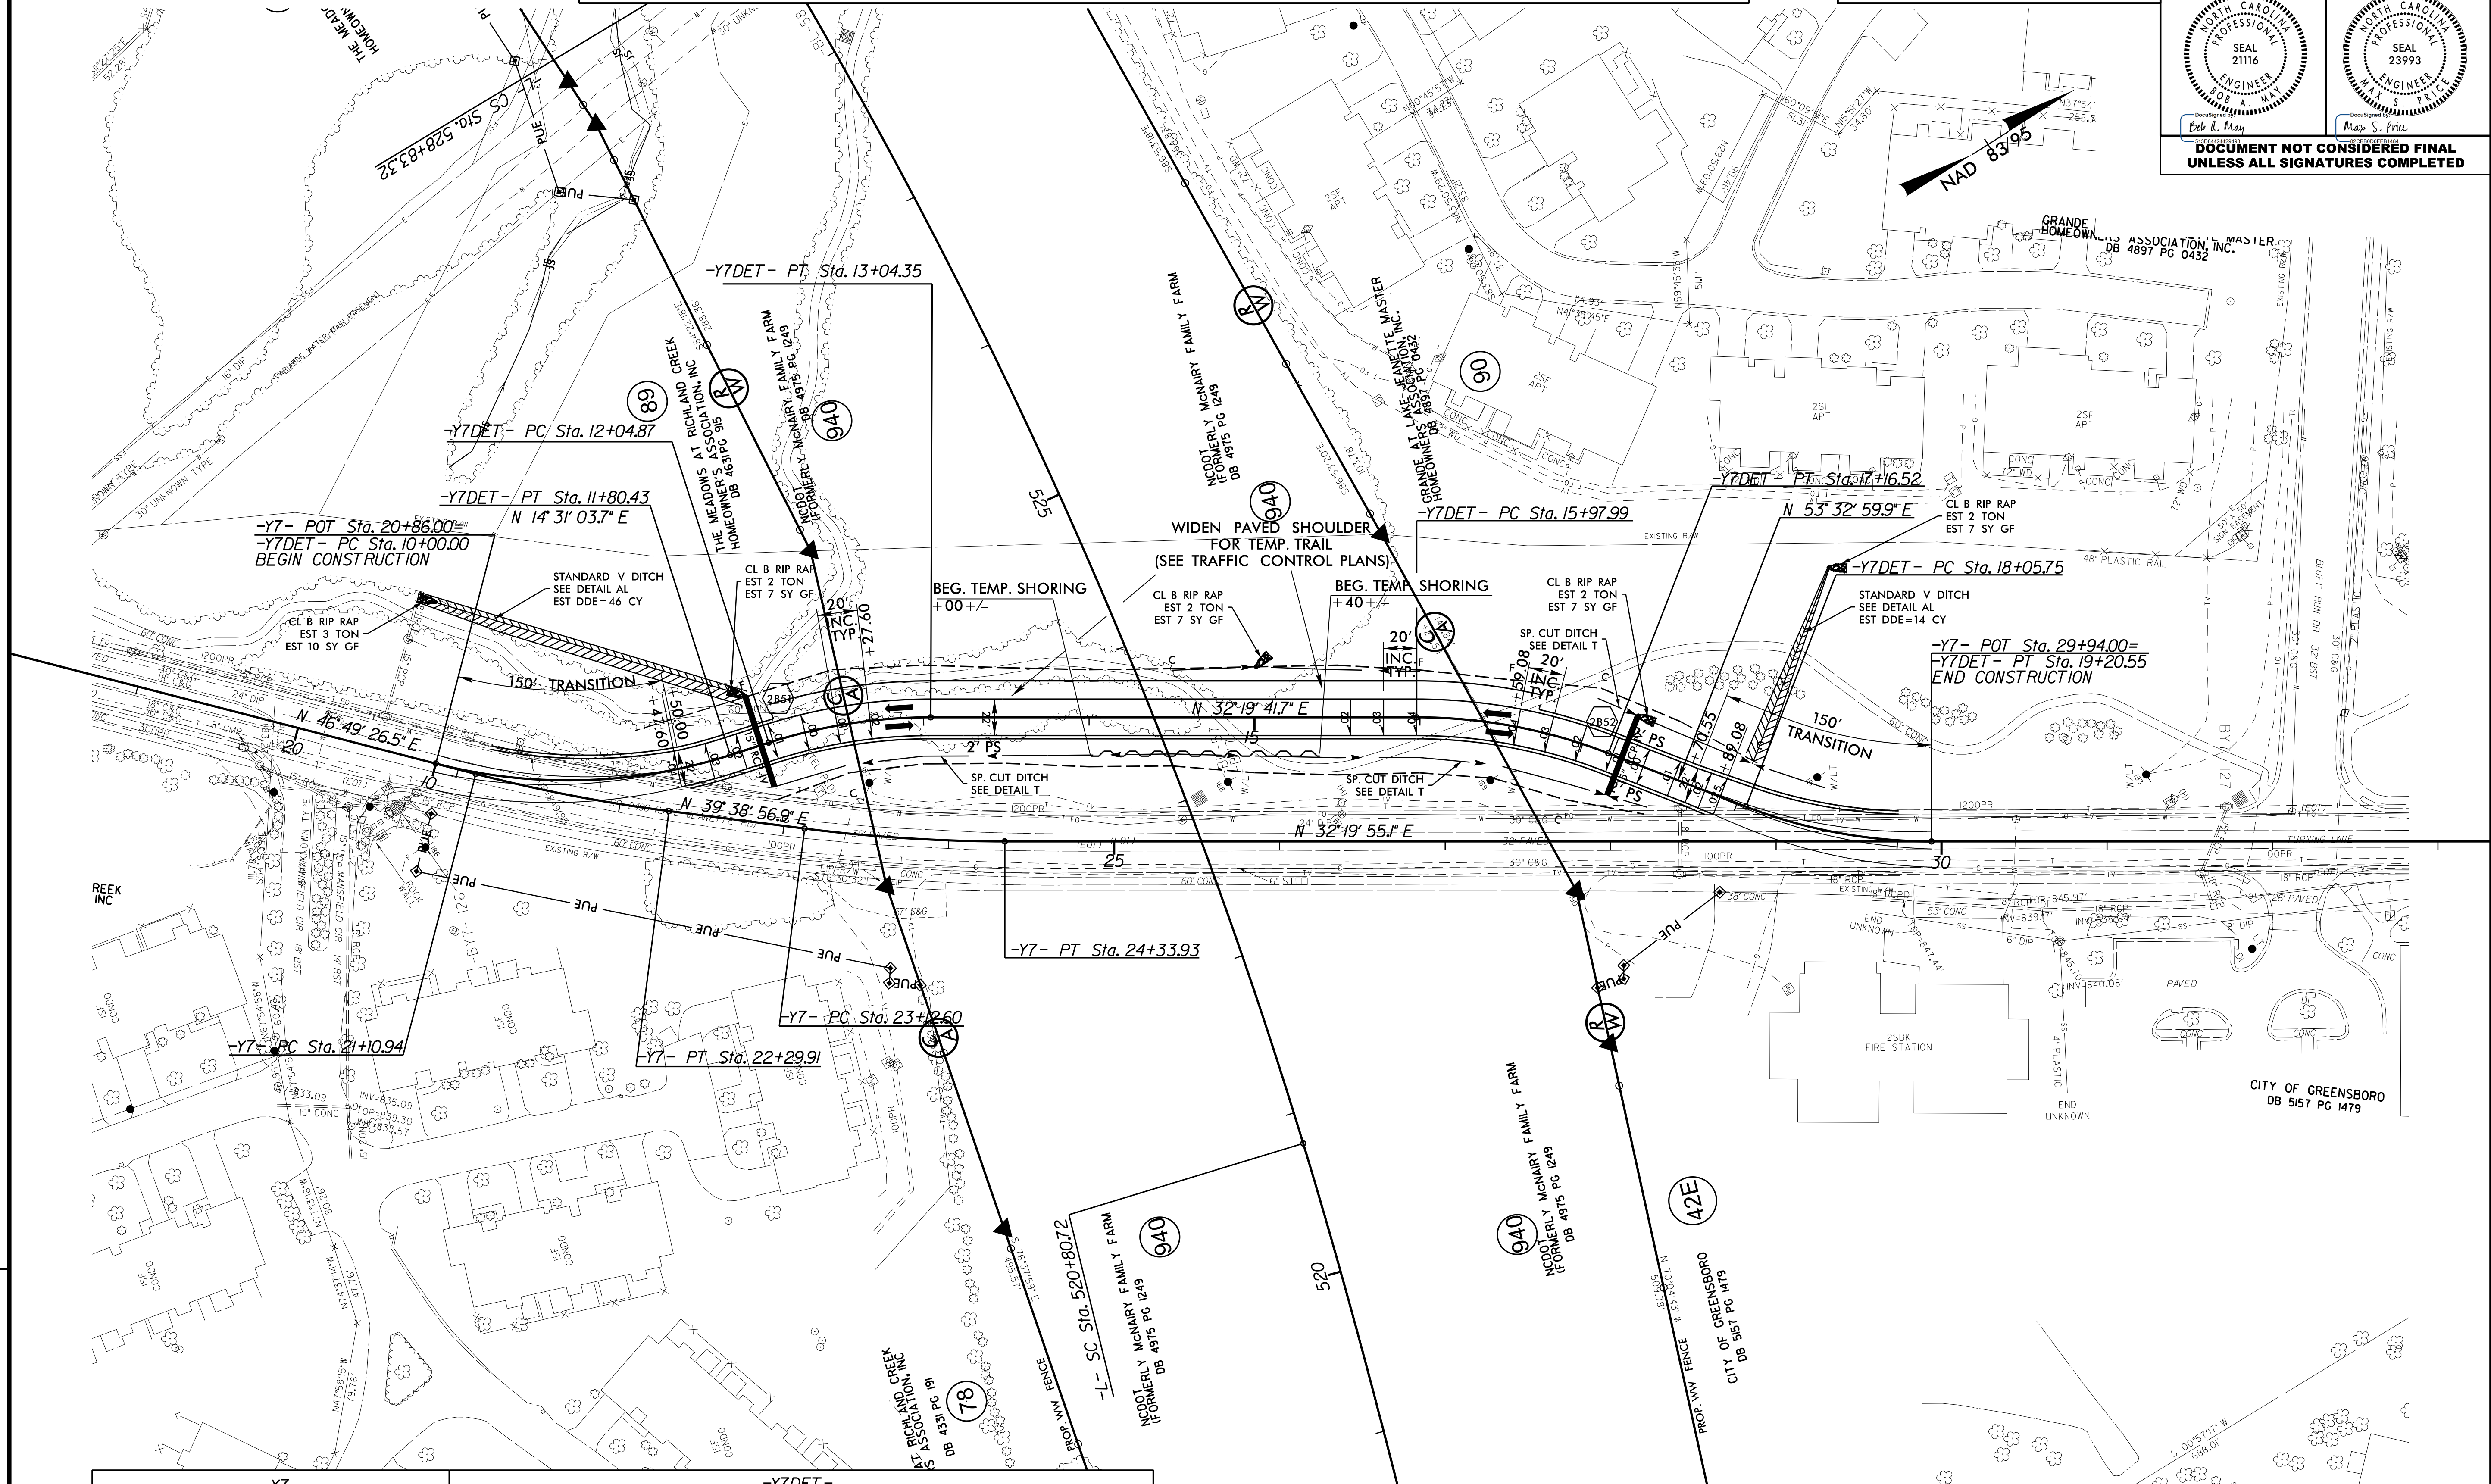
DET- (LAKE JEANETTE RD.)
